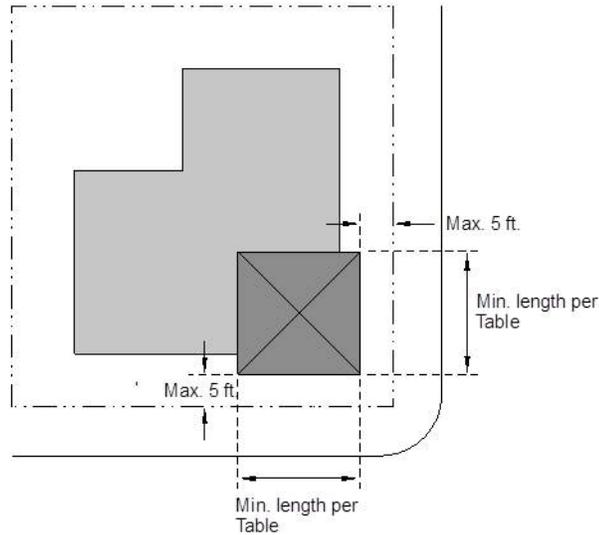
C: CORNER FRONTAGE STANDARDS
